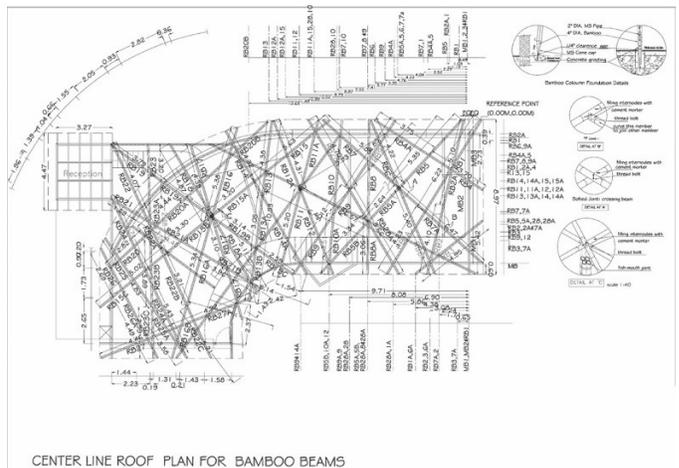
Bamboo Symphony, Bangalore centre line plan of roof and floor plan. (Source- Manasaram Architects)
